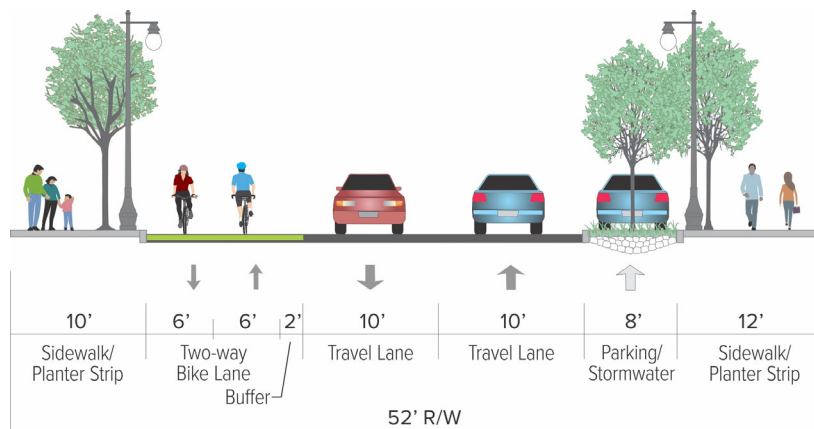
FROG POND EAST AND SOUTH MASTER PLAN CROSS-SECTIONS
